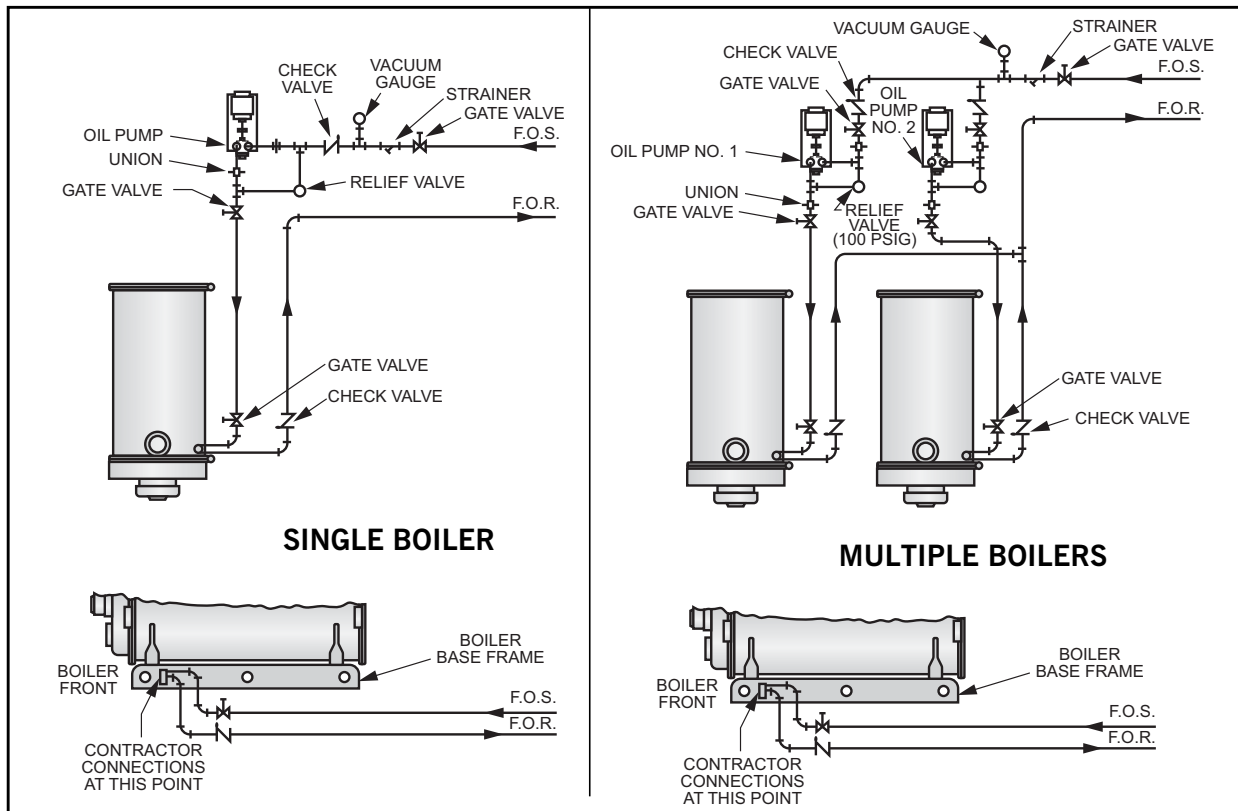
No. 2 Oil Piping, Remote Oil Pump
